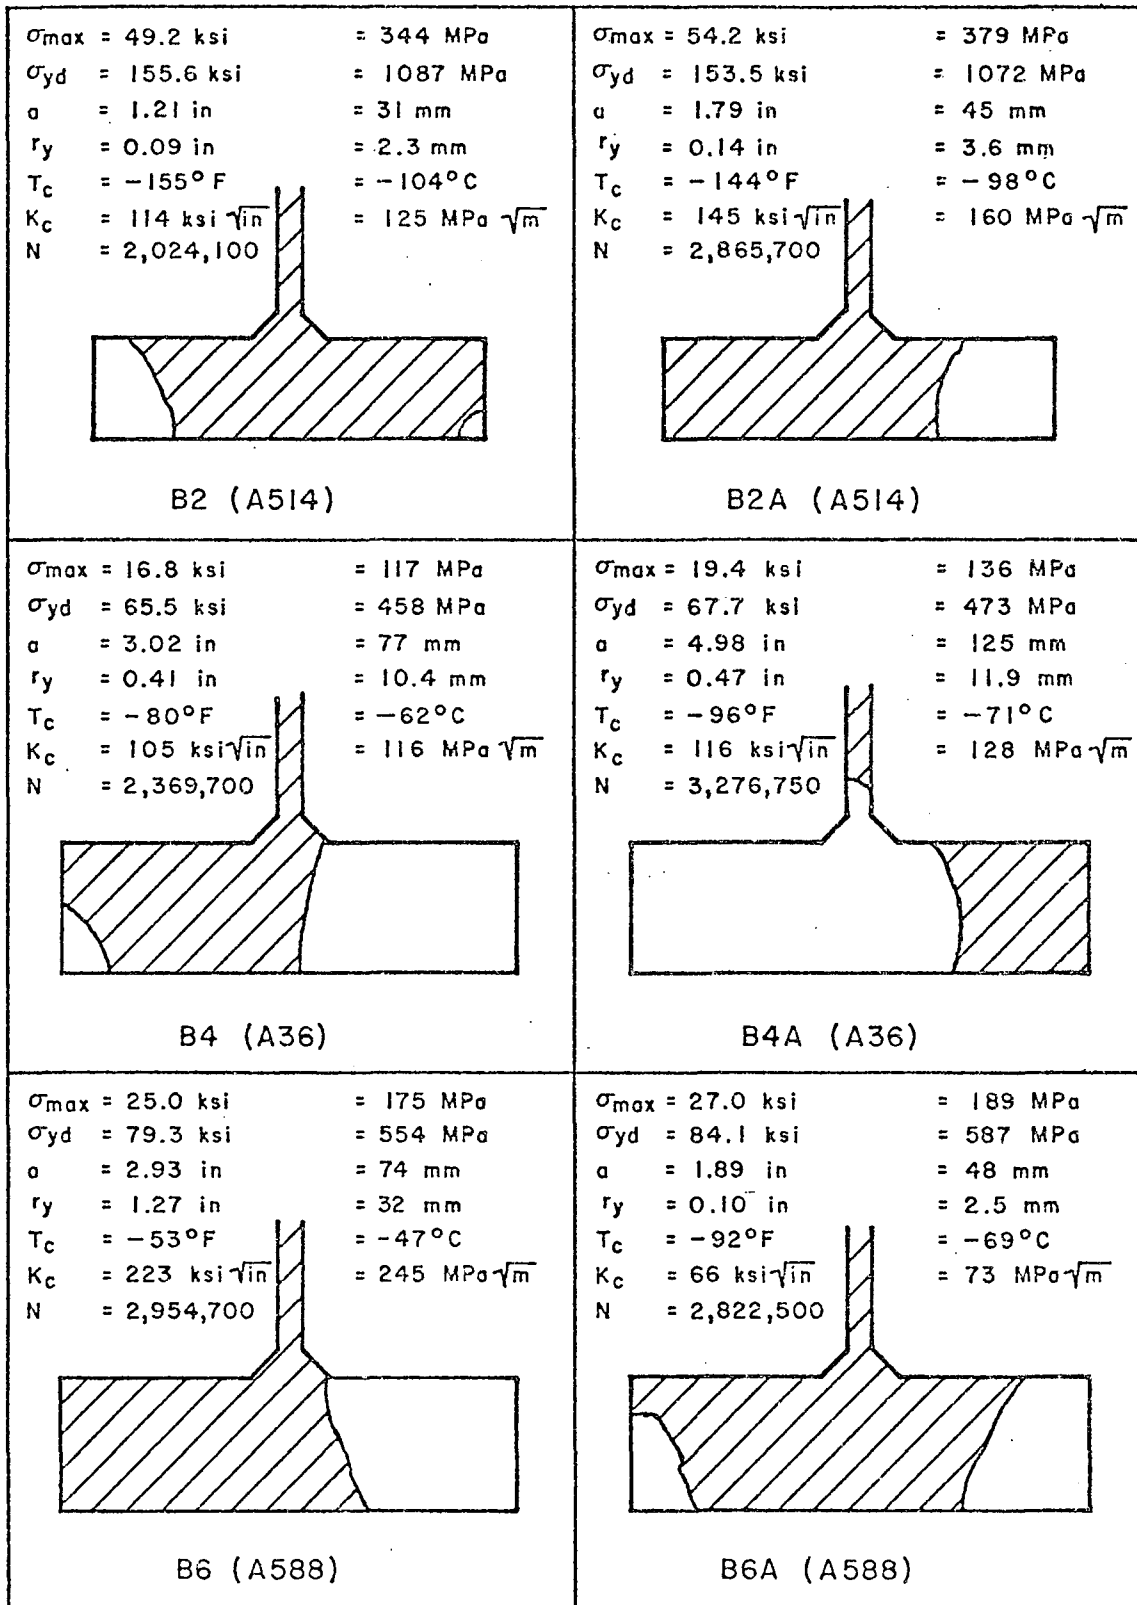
Fracture Surface Sketches and Data Summary
